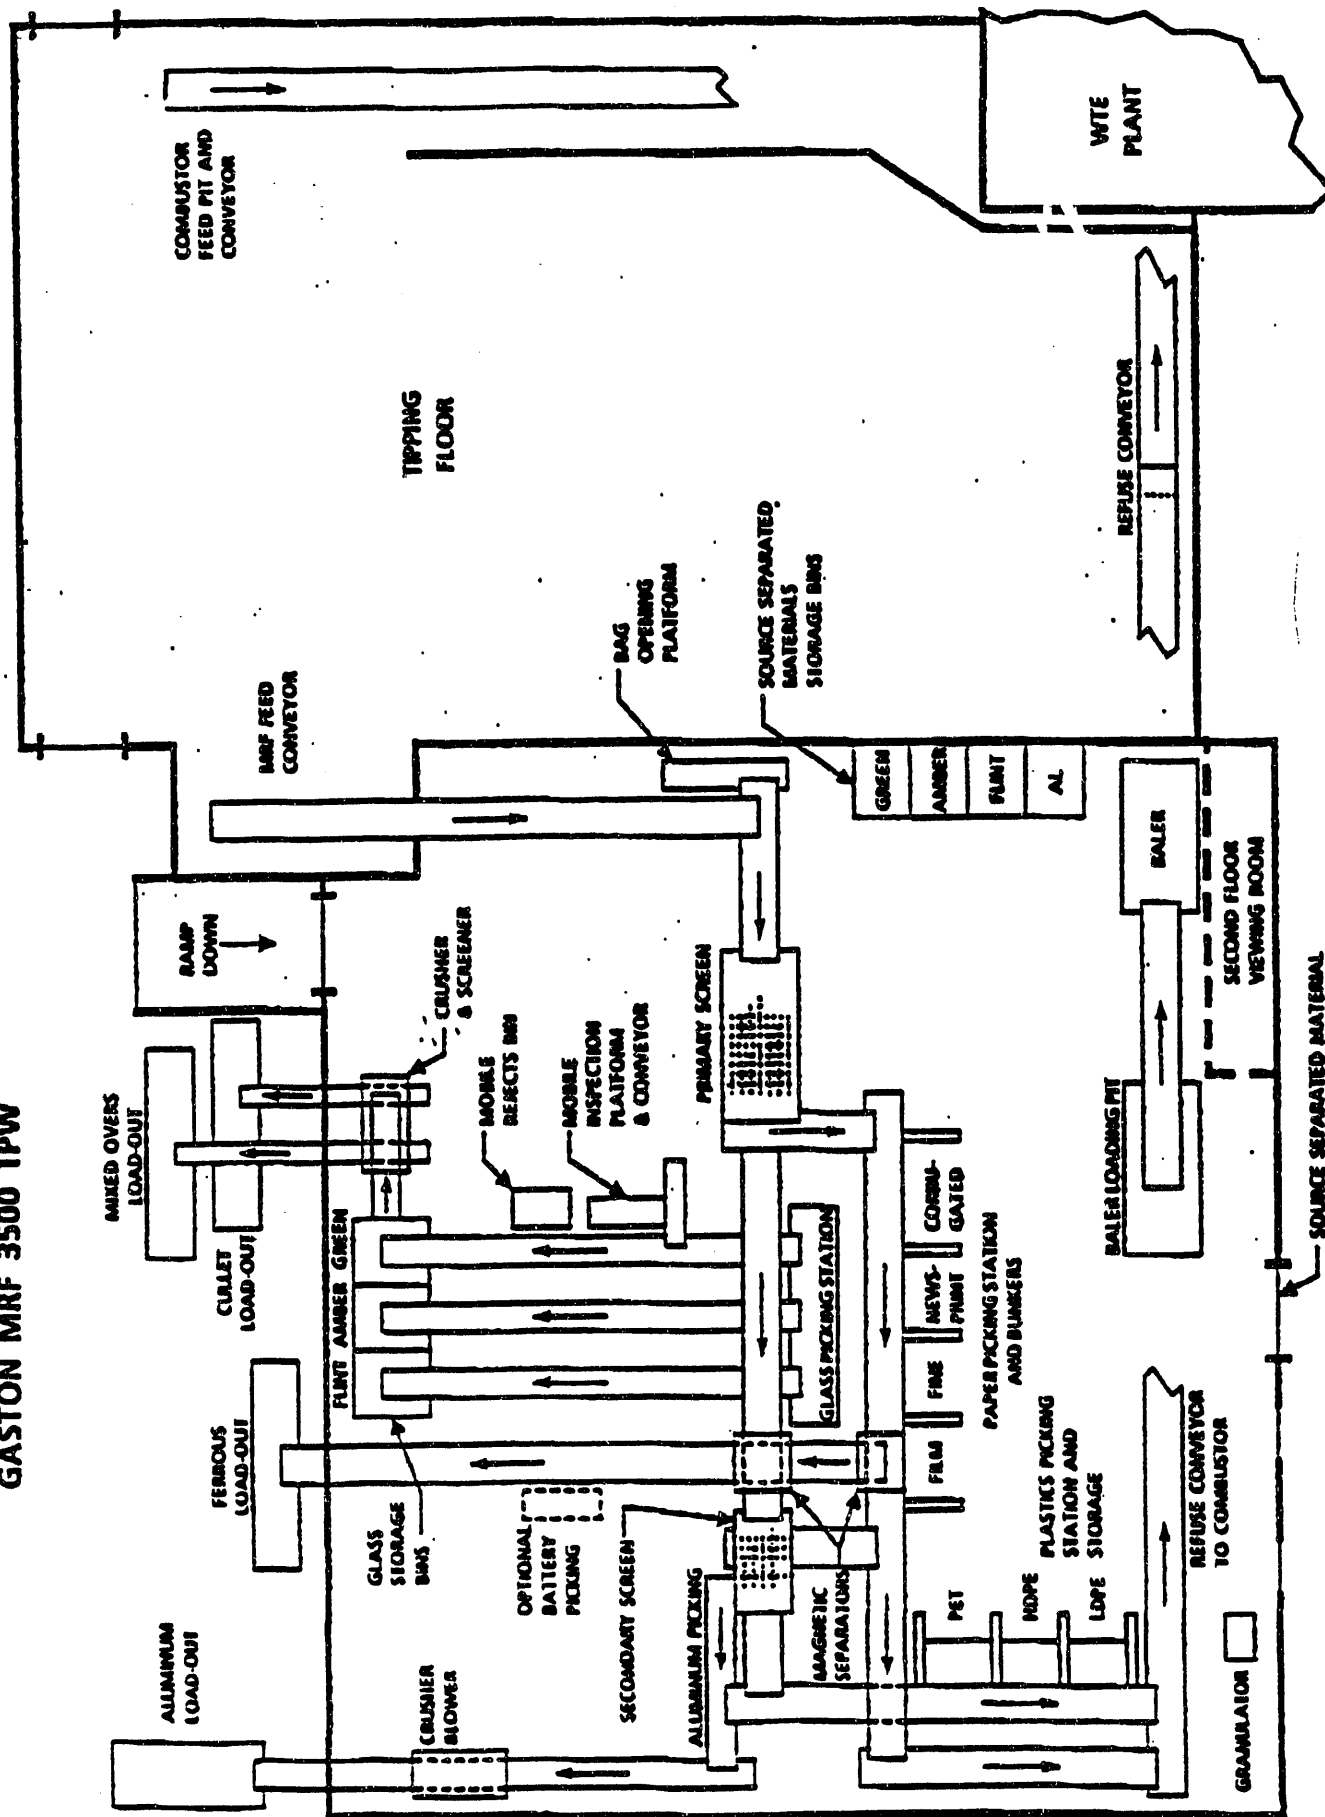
Floor Plan for Proposed Gaston County, North Carolina, Mixed Waste MRF
